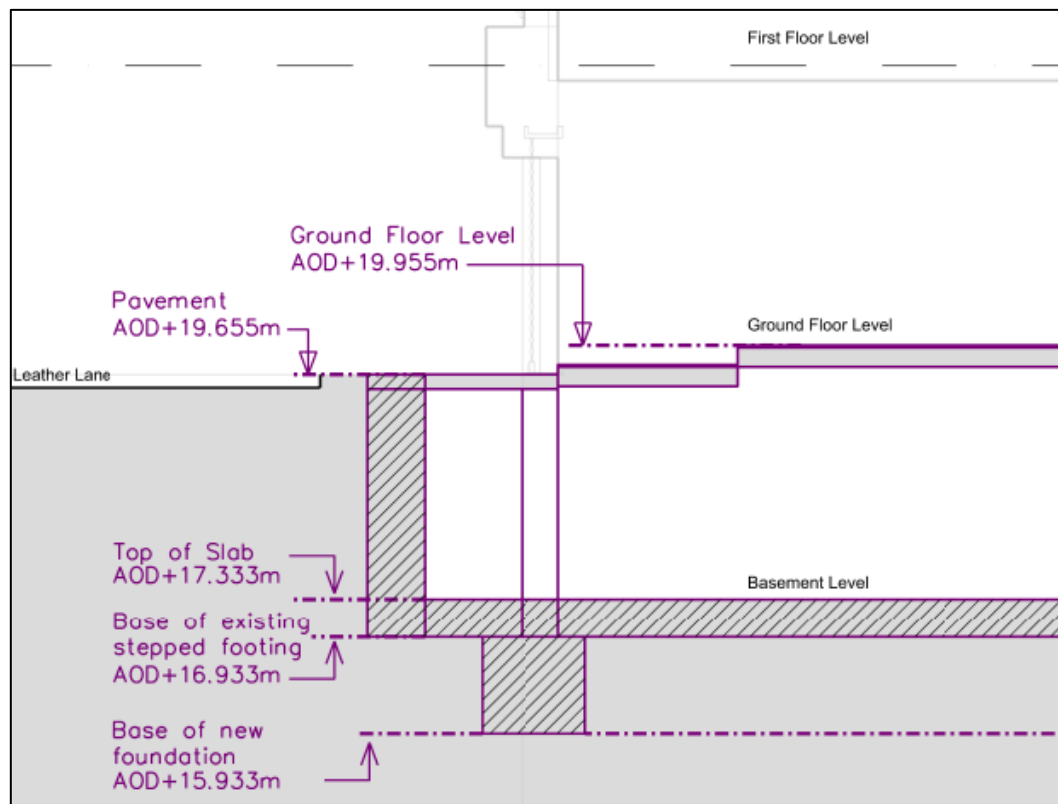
Cross-section of proposed basement (fronting onto Leather Lane)
